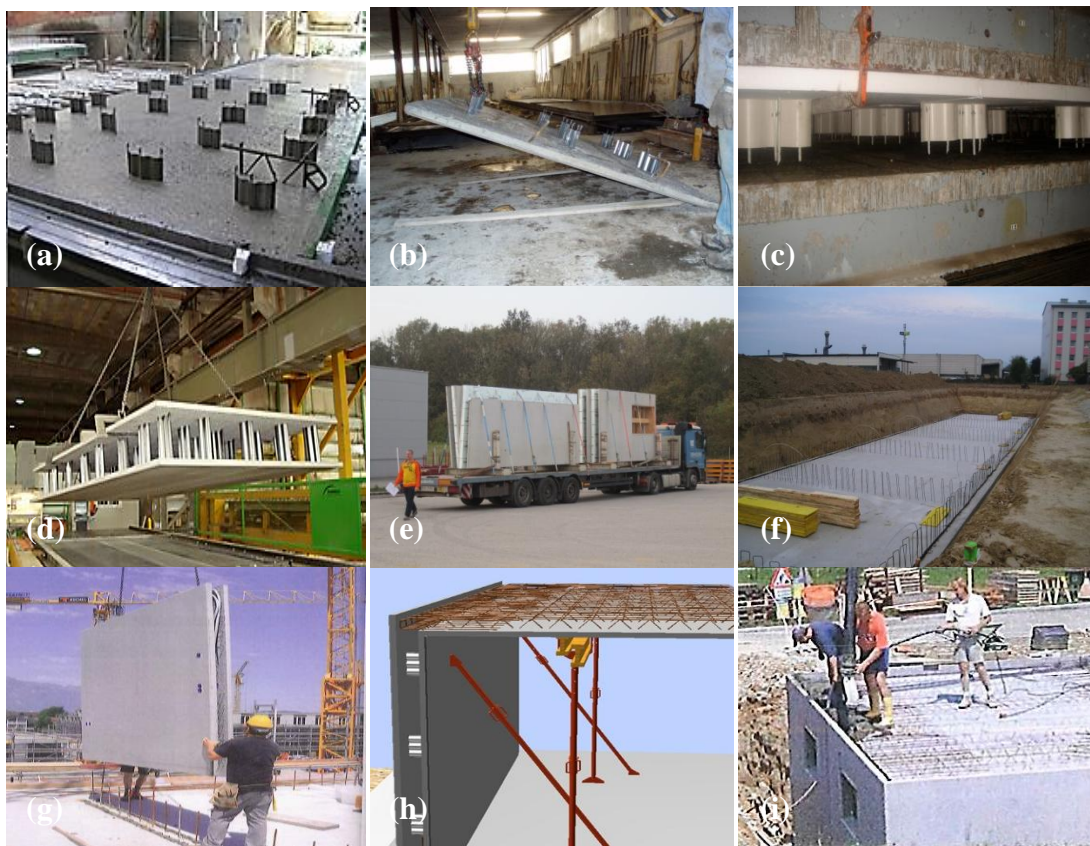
Construction Steps of Double Wall-Filigree Slab System; (a) Placement of Waves and Casting First Layer, (b) Rotating First Layer, (c) Fixing First Layer on the Second Layer with Fresh Concrete, (d) Moving to Storage, (e) Transportation, (f) Placing Starter Bars, (g) Installing Double Walls on Site, (h) Installing Filigree Slabs, (i) Casting Concrete on Site
